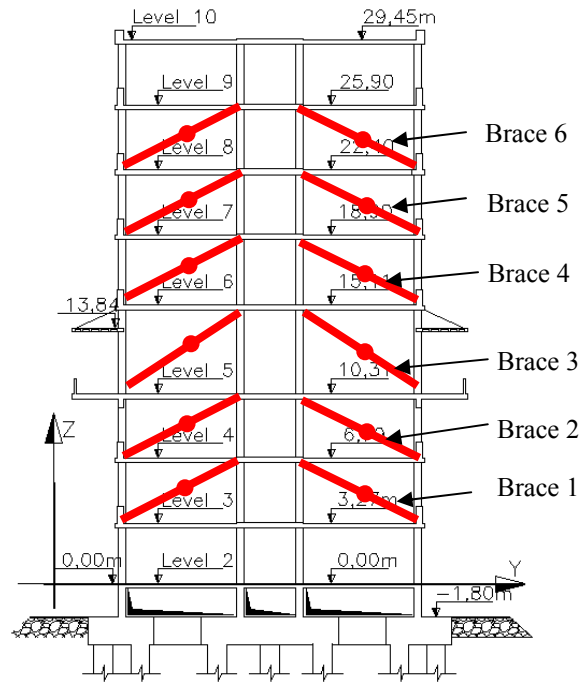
Distribution of the dissipative braces: Elevation layout (B-B section)
